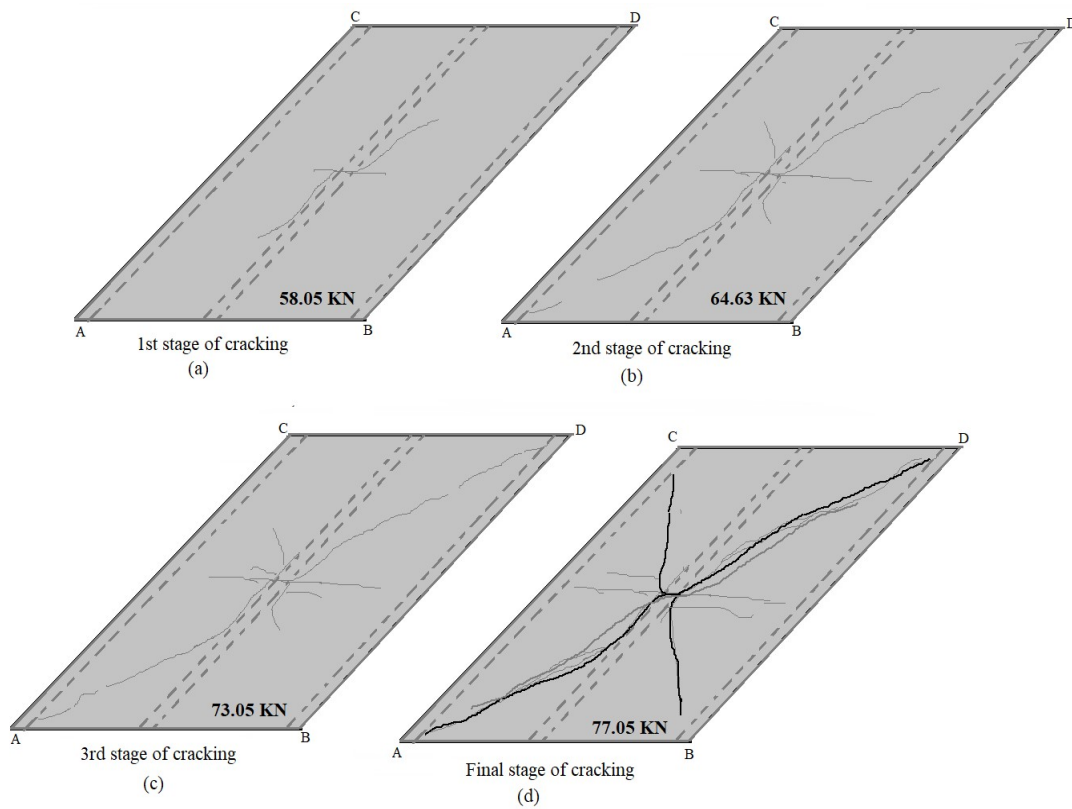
Cracking pattern of RC stiffened skew slab, S45B3 at various stages
